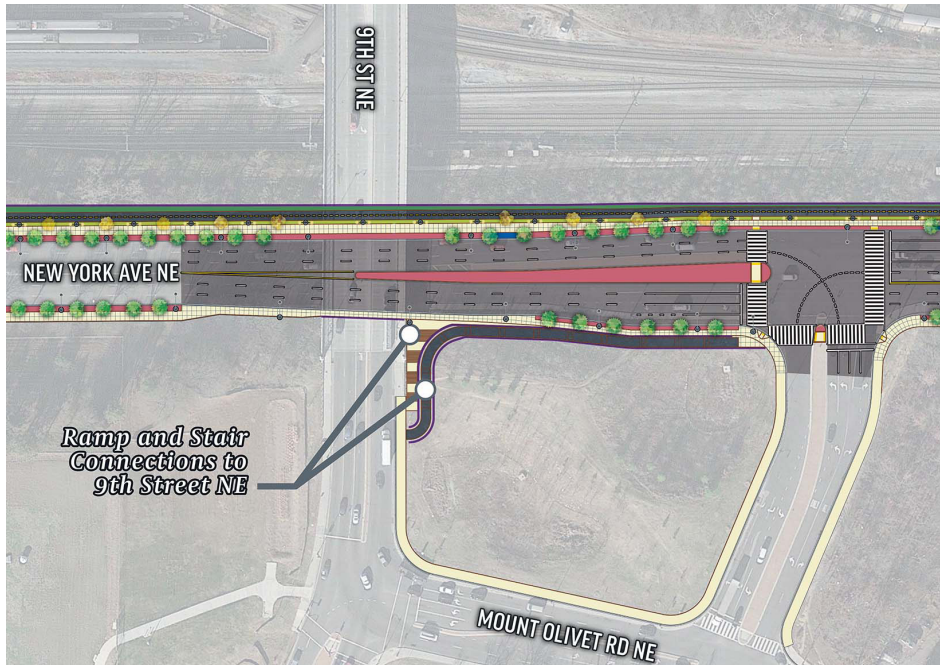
Proposed ramp and stair connection to 9th Street NE from New York Avenue NE.
